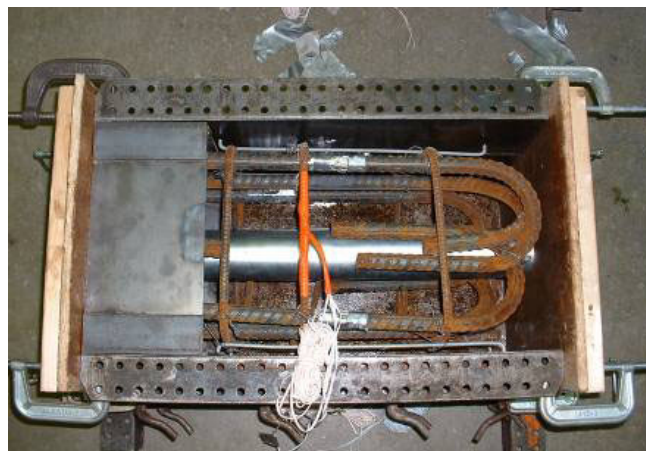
Photograph of Column 3, 2 ft. segment reinforcement in forms.
